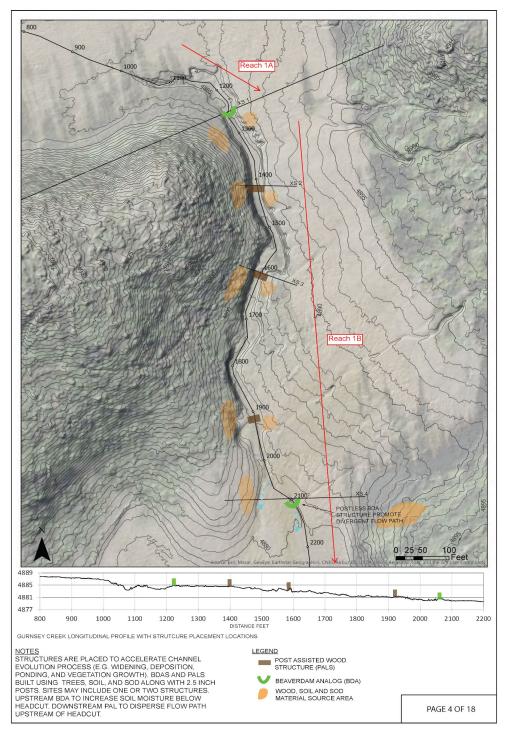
Old plan view for Areas 1A and 1B showing locations of cross sections referenced in Figure B2
